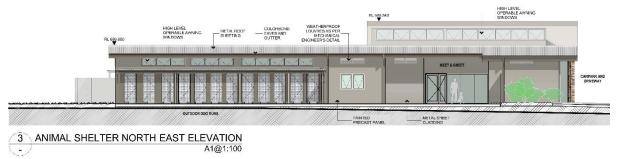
B: DA approved section of external wall at north-eastern (and south-eastern) façade (source: F&J Tepa)
